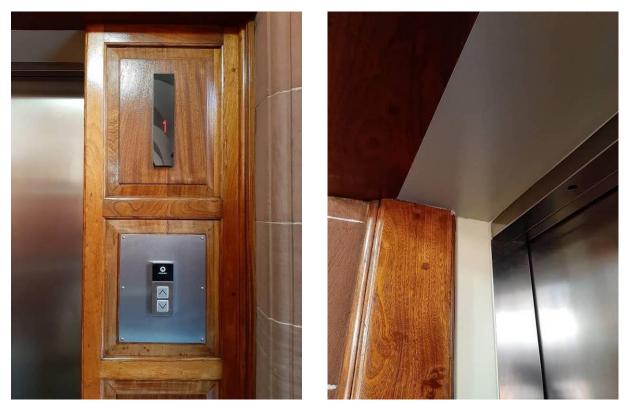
& 51\_Detail of wooden cladding with new control panel for Passenger lift, wooden cladding was put back in place and not damaged after lift was replaced (Source: tsica heritage consultants, 09.07.2019)
